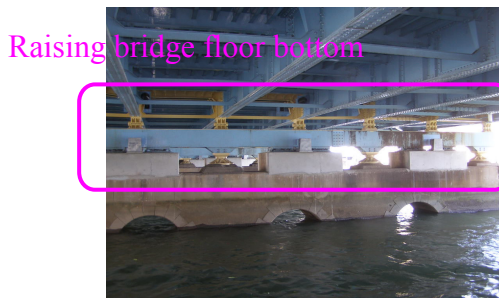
Raising Bridge Floor Bottom by a Steel Beam.
